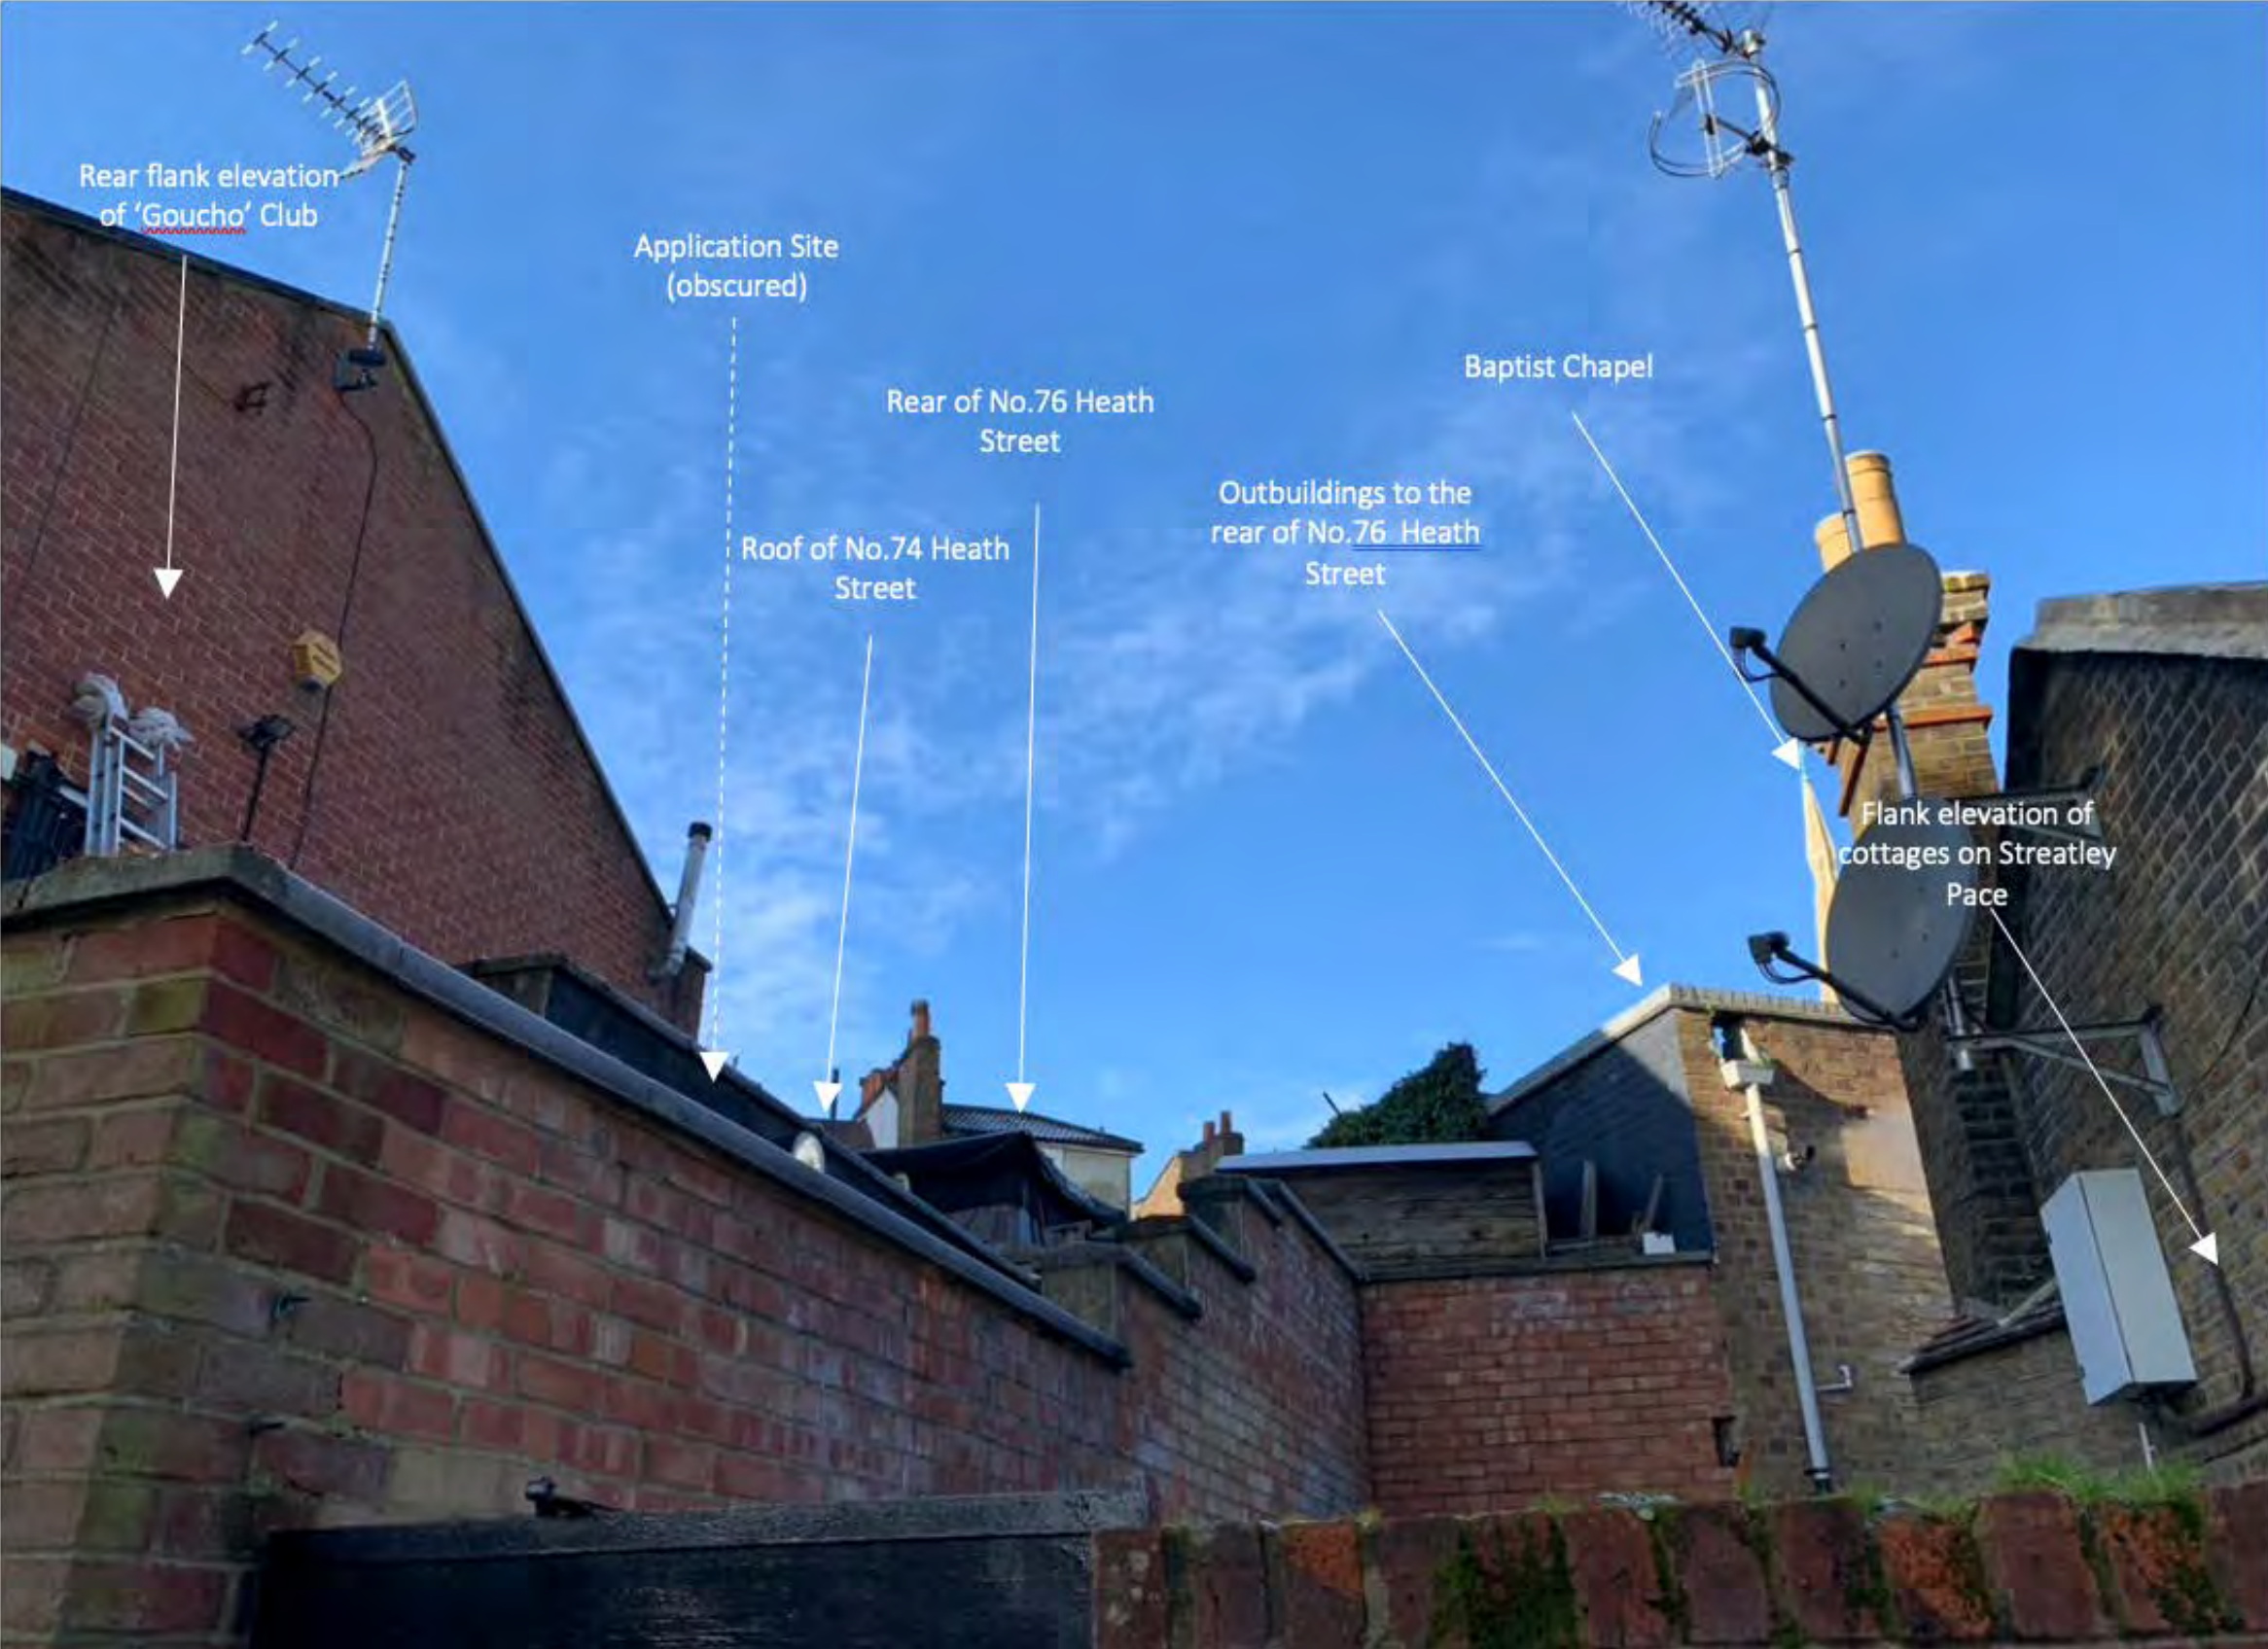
The Property and the proposed extension will not be visible from Streatley Place. (View looking southeast towards the Application Site)
